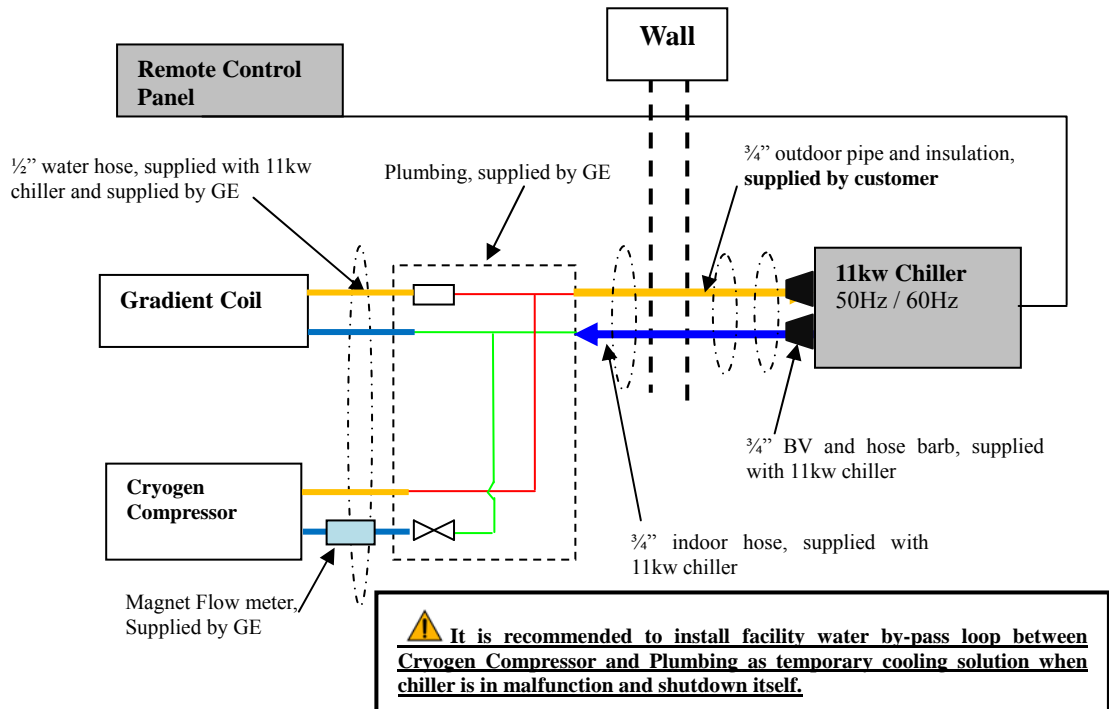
Outdoor Piping/Hose Connection for Cooling Type C
